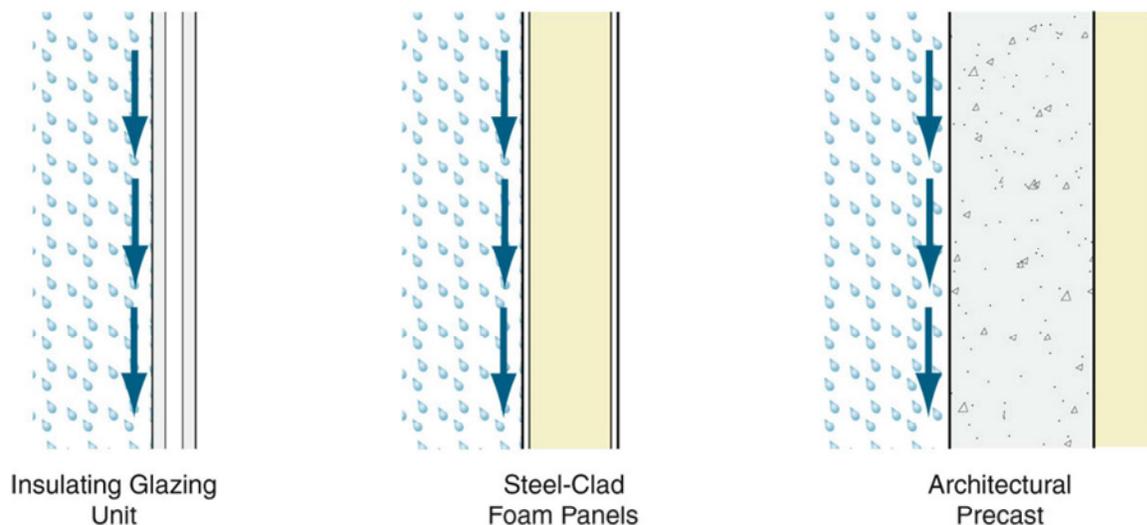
Examples of the perfect barrier approach to precipitation management. Note that the architectural precast panel joints should be designed as two-stage joints (See Section 5.3.1). Image copyright RDH Building Science Inc., used with permission
